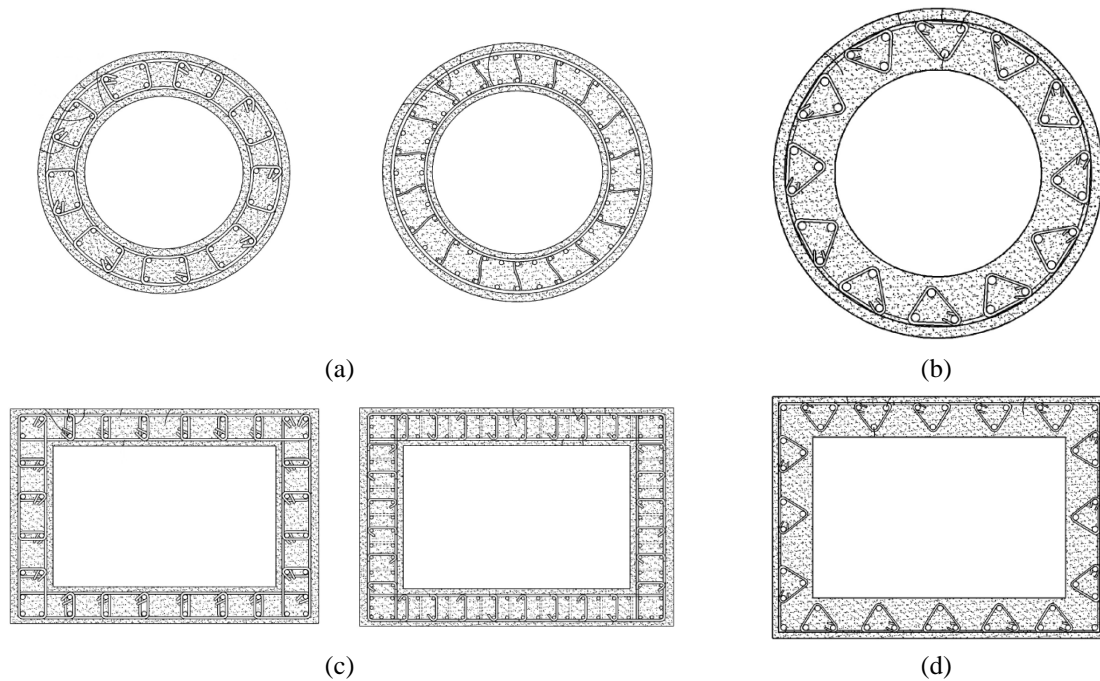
Hollow RC bridge column sections with reinforcement details for material quantity reduction Kim *et al.* (2013): (a) existing reinforcement details (circular sections), (b) proposed reinforcement details (circular sections), (c) existing reinforcement details (rectangular sections) and (d) proposed reinforcement details (rectangular sections)
